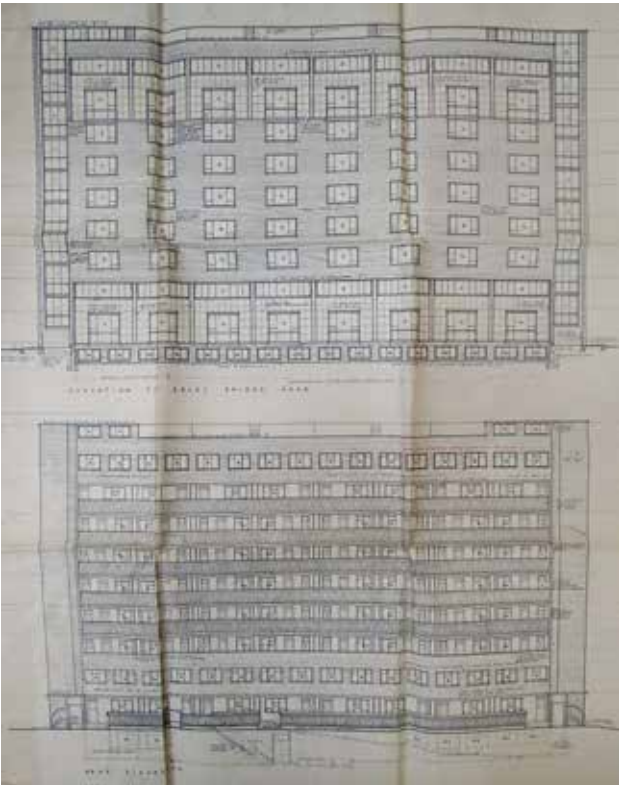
1954 Drainage applications and plans at 41-43 Ebury Bridge Road for Edgson House (Westminster Catalogue).
